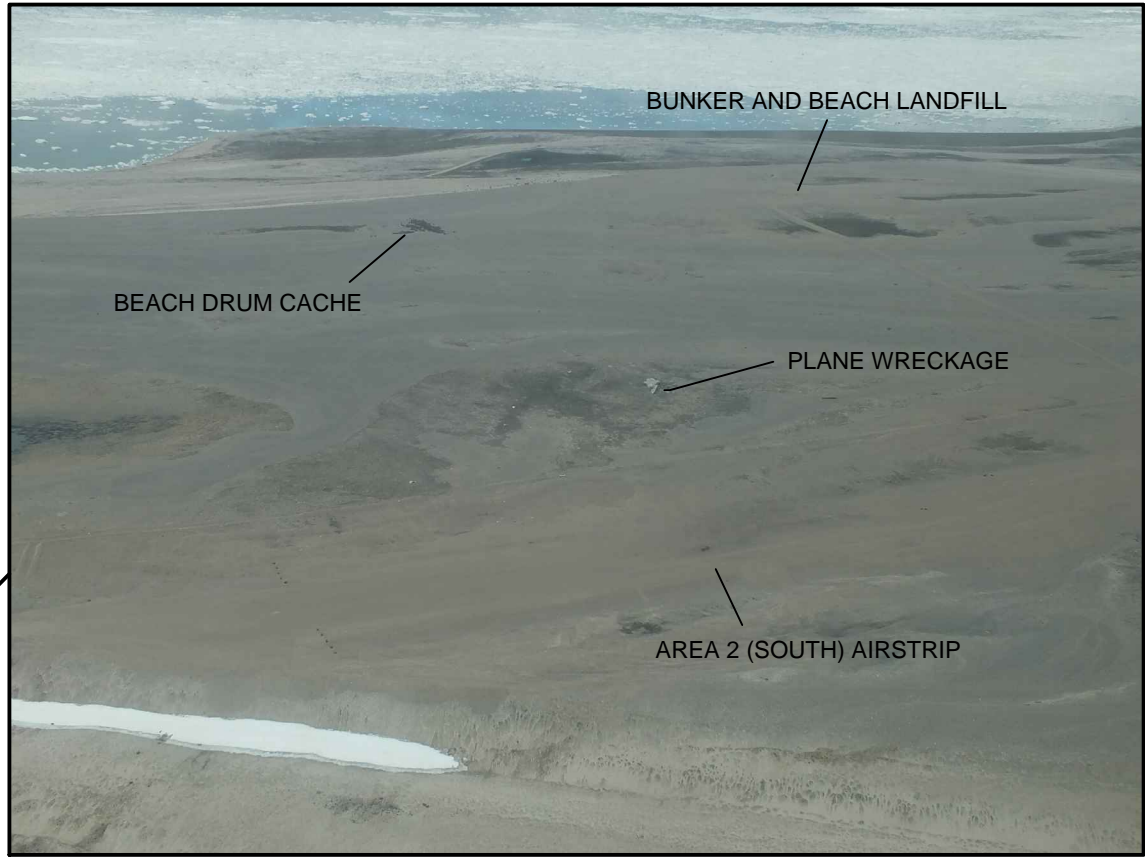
OVERVIEW OF AREA 2 WITH BEACH DRUM CACHE AND BUNKER AND BEACH LANDFILL, FACING WEST
